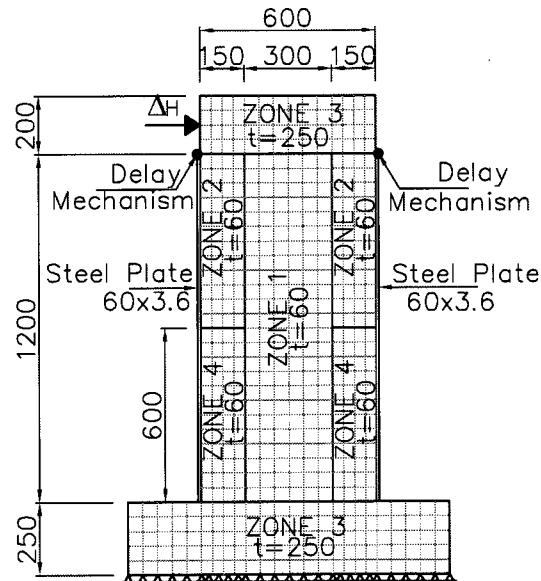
Finite Element Mesh of Wall IC-SW34. All Dimensions in mm
